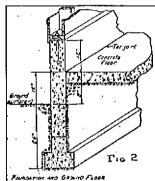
Showing a Good Method of Making Foundation and Floor of a New Buildling Ratproof. .
